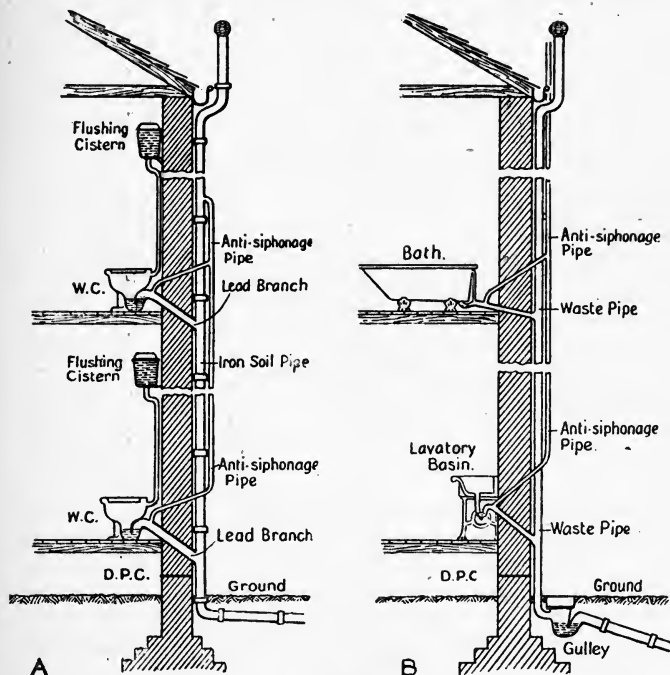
A, Soil pipe. Note position of antisiphonage pipes and connection of soil pipe with underground drain. B shows method of disconnecting the waste pipe from drain through a trapped gully.
